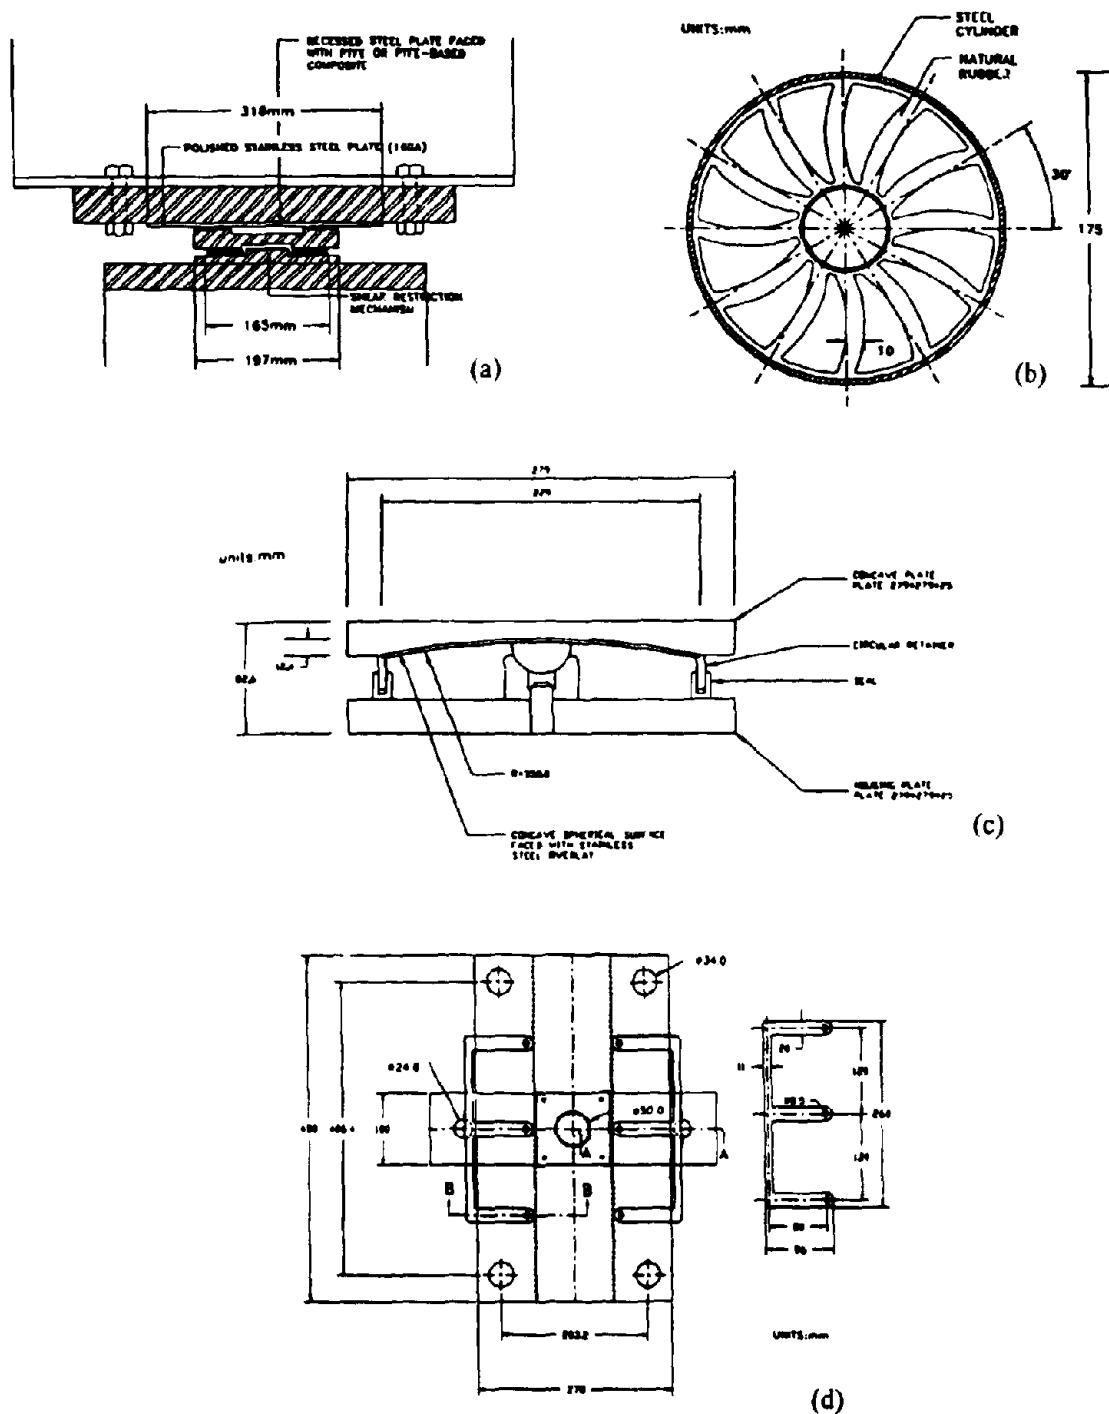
ELEMENTS OF ISOLATION SYSTEMS (a) FLAT SLIDING BEARING (b) RUBBER SPRING (c) FPS BEARING (d) LUBRICATED SLIDING BEARING WITH E-SHAPED STEEL DAMPERS
